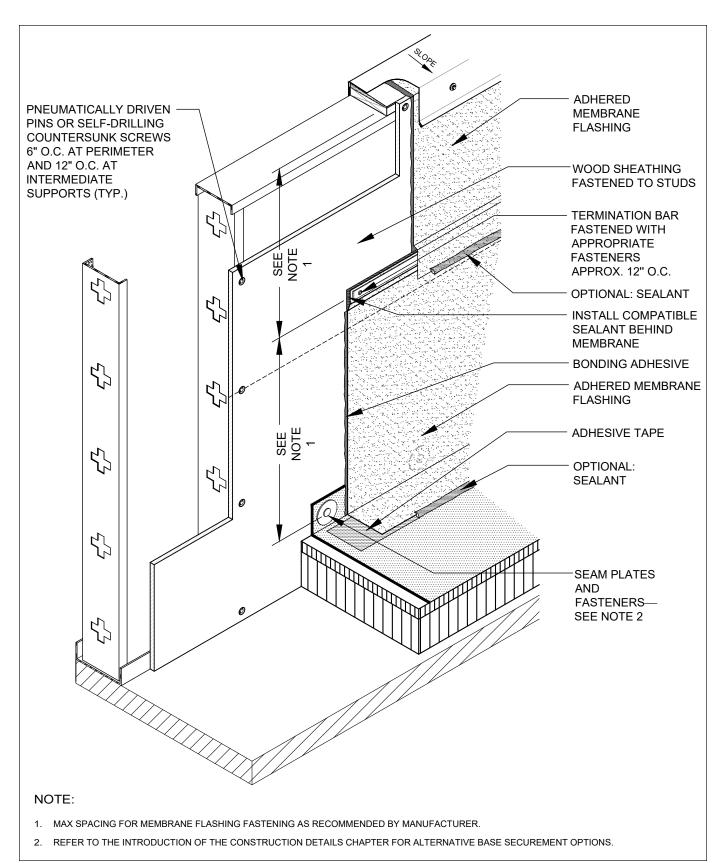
Base securement for EPDM membranes at a steel stud wall with wood sheathing fastening substrate
